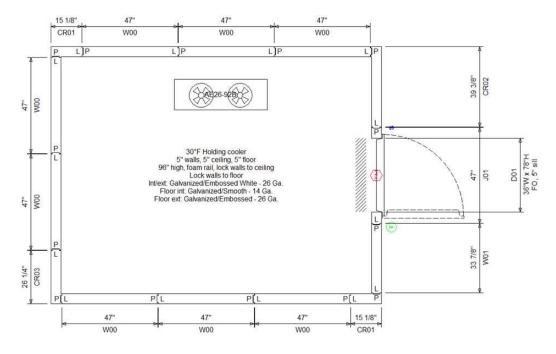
INSTALLATION DRAWING - EXAMPLE ONLY
